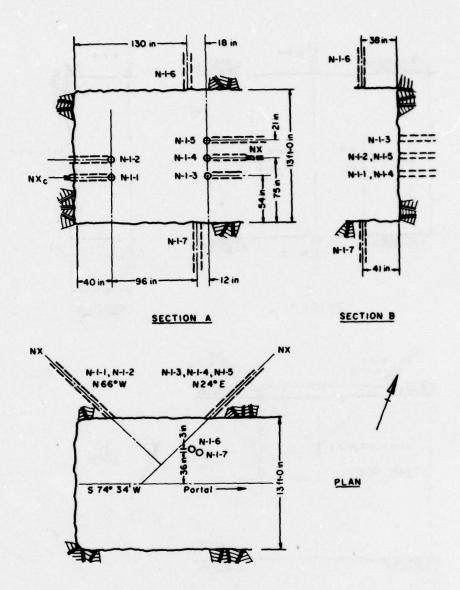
Detail plan and section of site 1 -- tunnel N - (drift L.O.S. No. 2)
